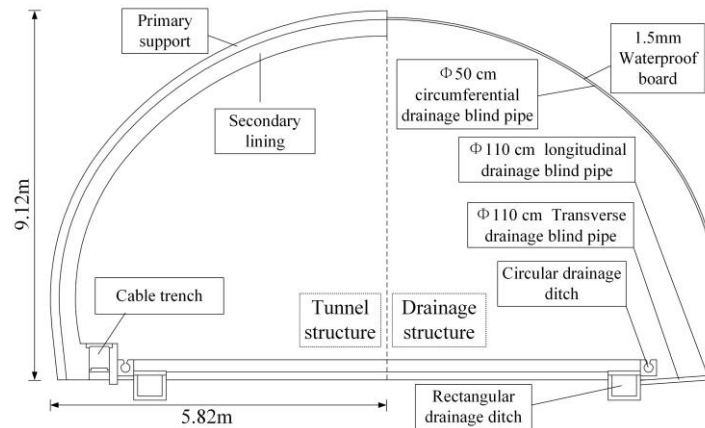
Tunnel structure and drainage system of Dayaoshan No.1 Tunnel LK36+265
